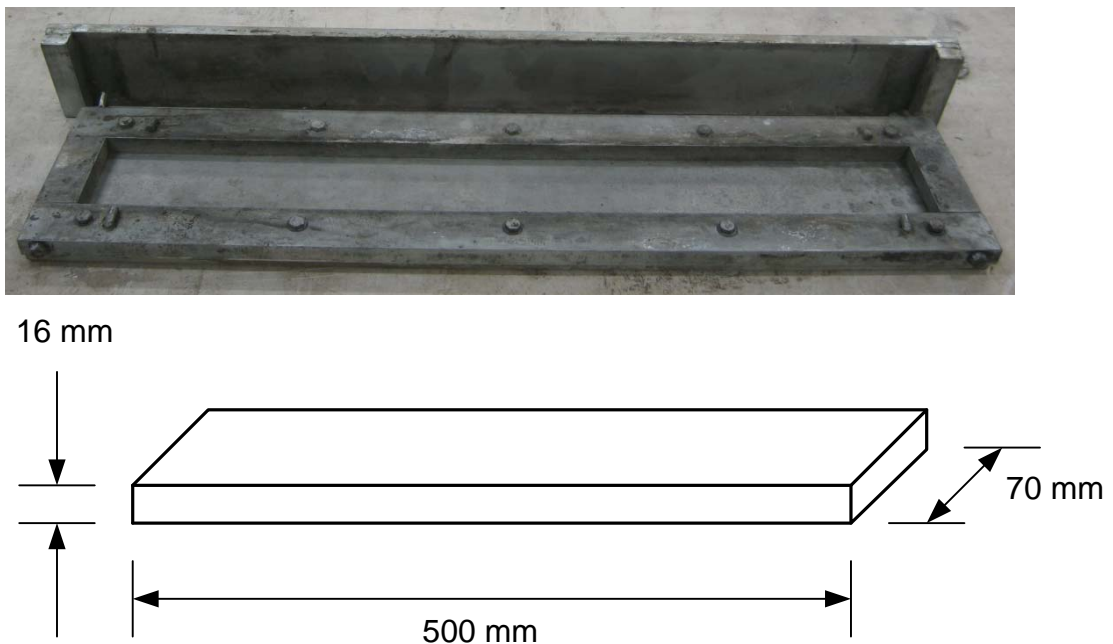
Picture of steel mould with dimensions of the beam specimens.
